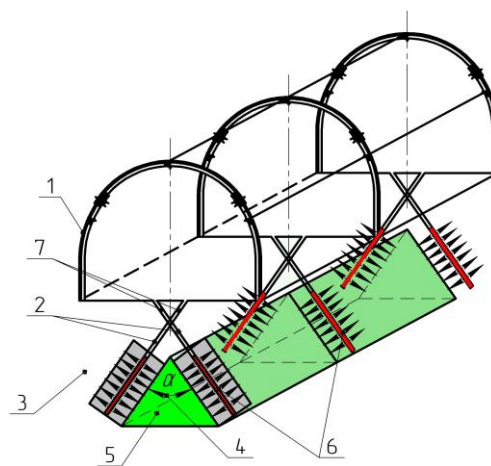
Method for controlling the floor heave: 1 – mine roadway; 2 – borehole; 3 – floor rocks; 4 – the angle at the prism base triangle apex of strengthened rocks; 5 – strengthened zone; 6 – self-expanding hardening solution; 7 – sealing material
